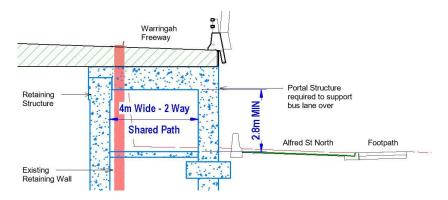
showing resident design proposal cantilever structure and existing retaining wall
